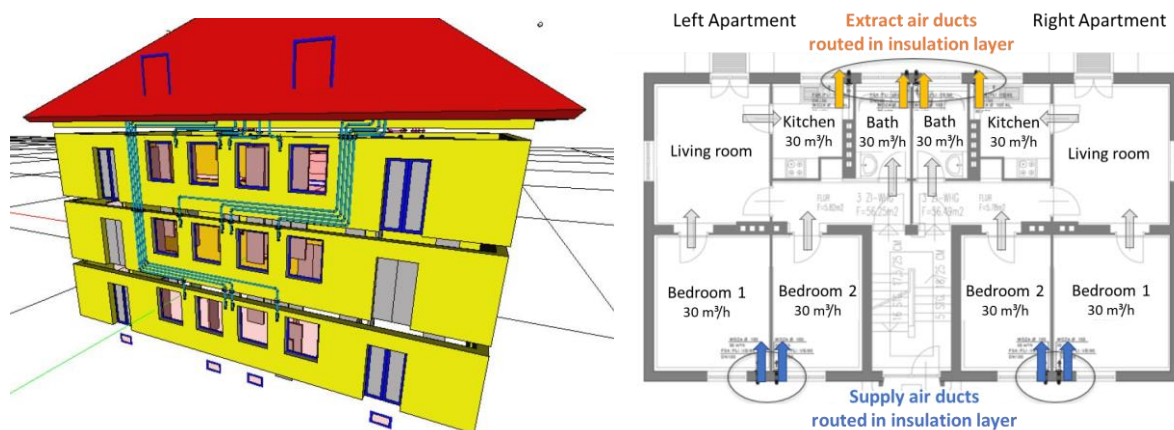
Left: 3D sketch of one of the case studies installing the supply and extract air ducts in the exterior wall insulation. Source: (Music 2018). Right: Floor plan of the case study where all supply and extract air ducts are integrated in the external wall insulation. Note that the living rooms are ventilated with overflowing air (extended cascade principle).
